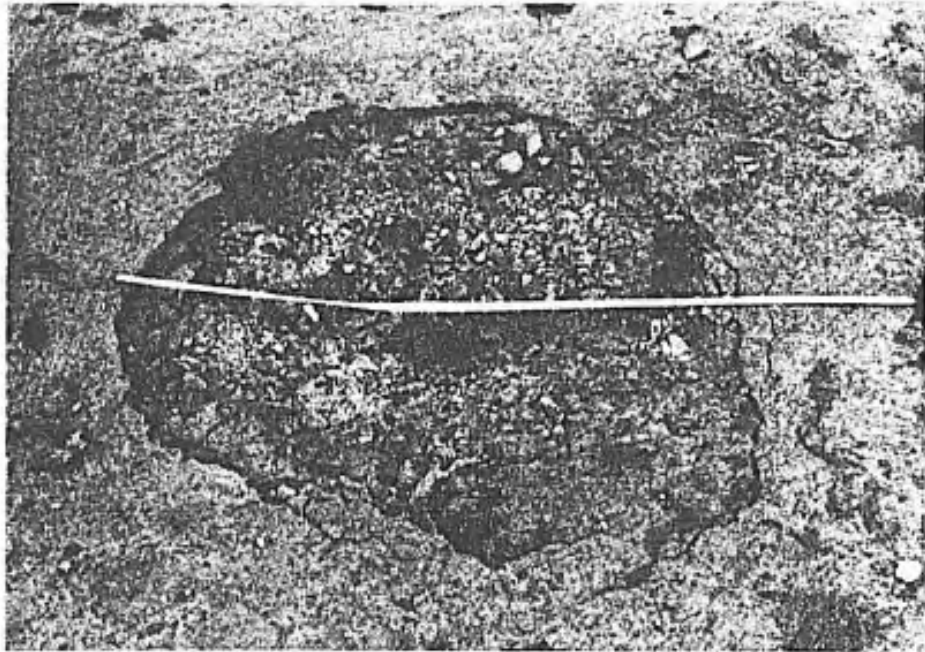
Damage to a Slab From a 9-pound Charge of TNT.
